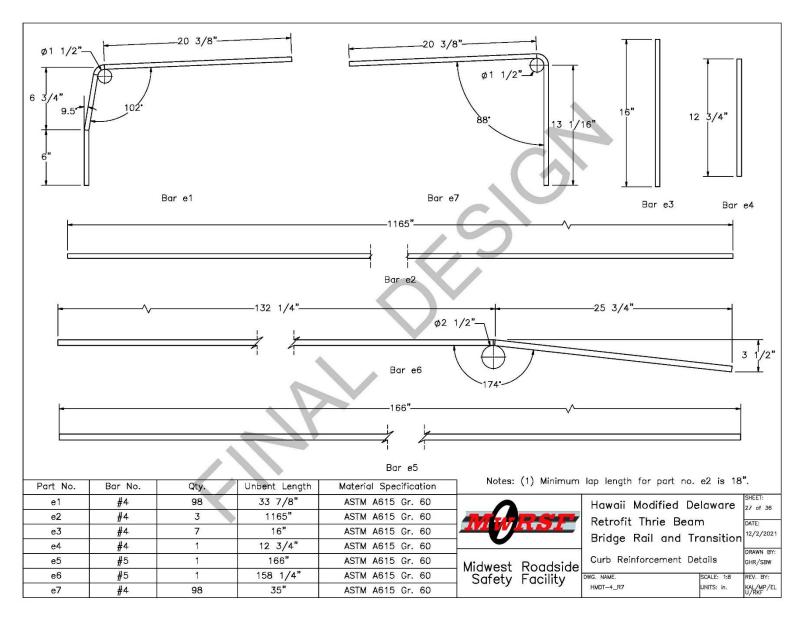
Curb Reinforcement Details, Test No. HMDT-4
